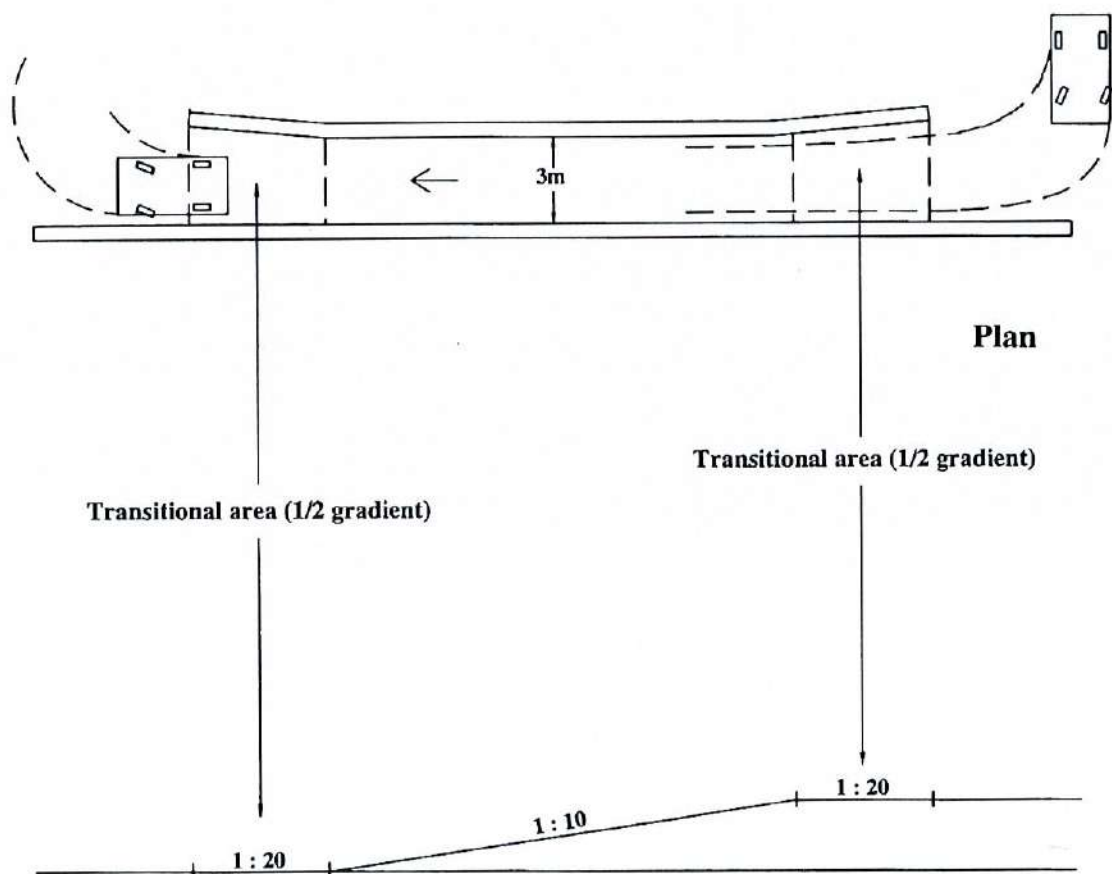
AN EXAMPLE OF STRAIGHT RAMP (WITH 'FLAT SECTION')
